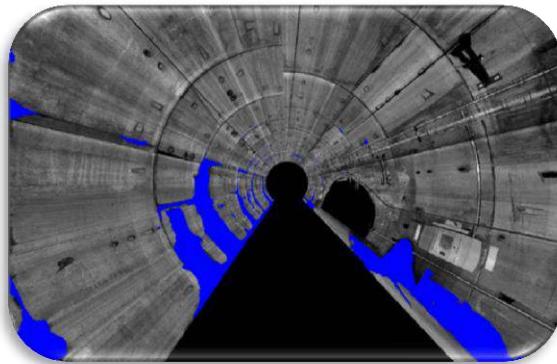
Example Intensity Image Showing Detected Moisture on Tunnel Wall
